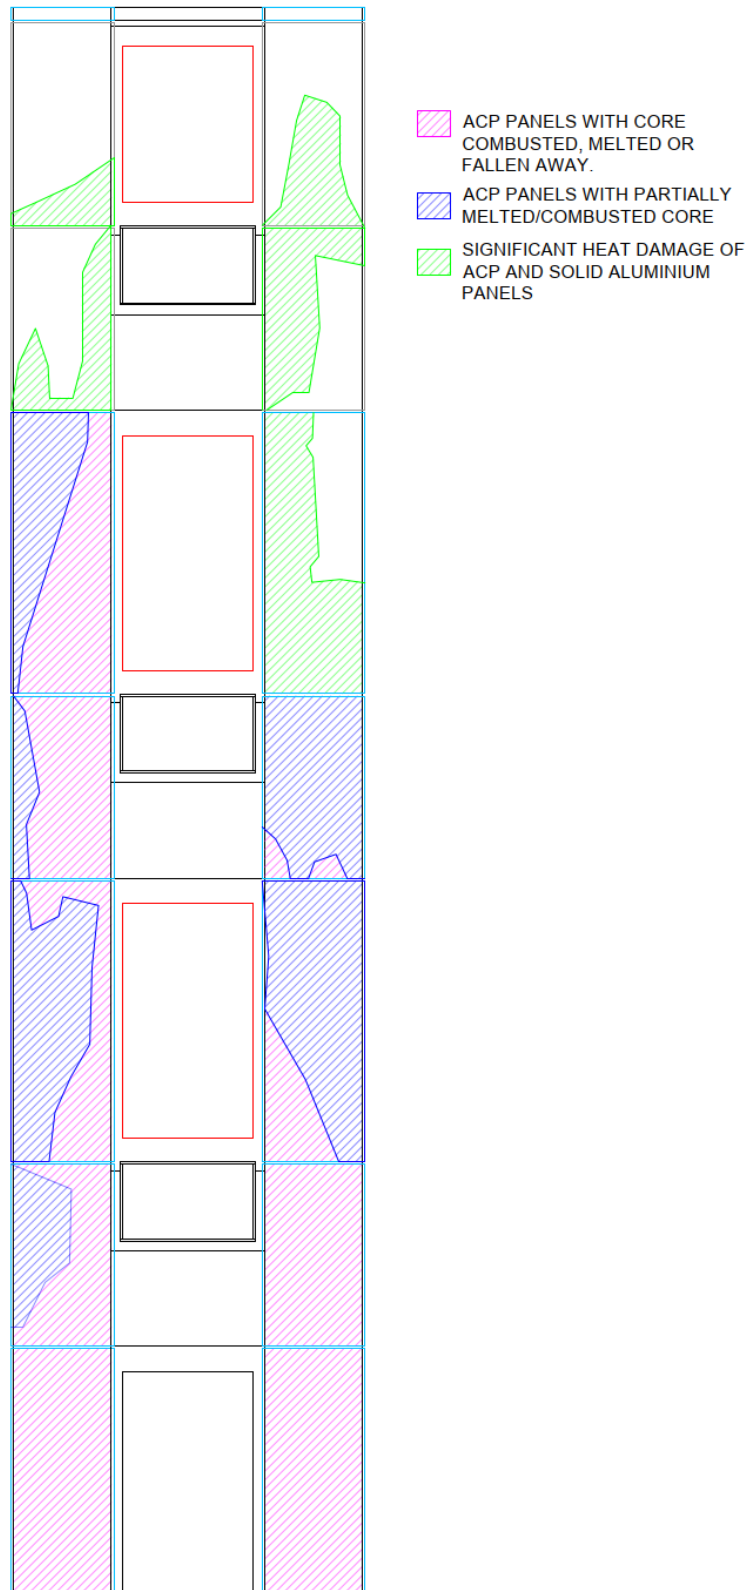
The external wall system – 15 minutes after crib was extinguished
